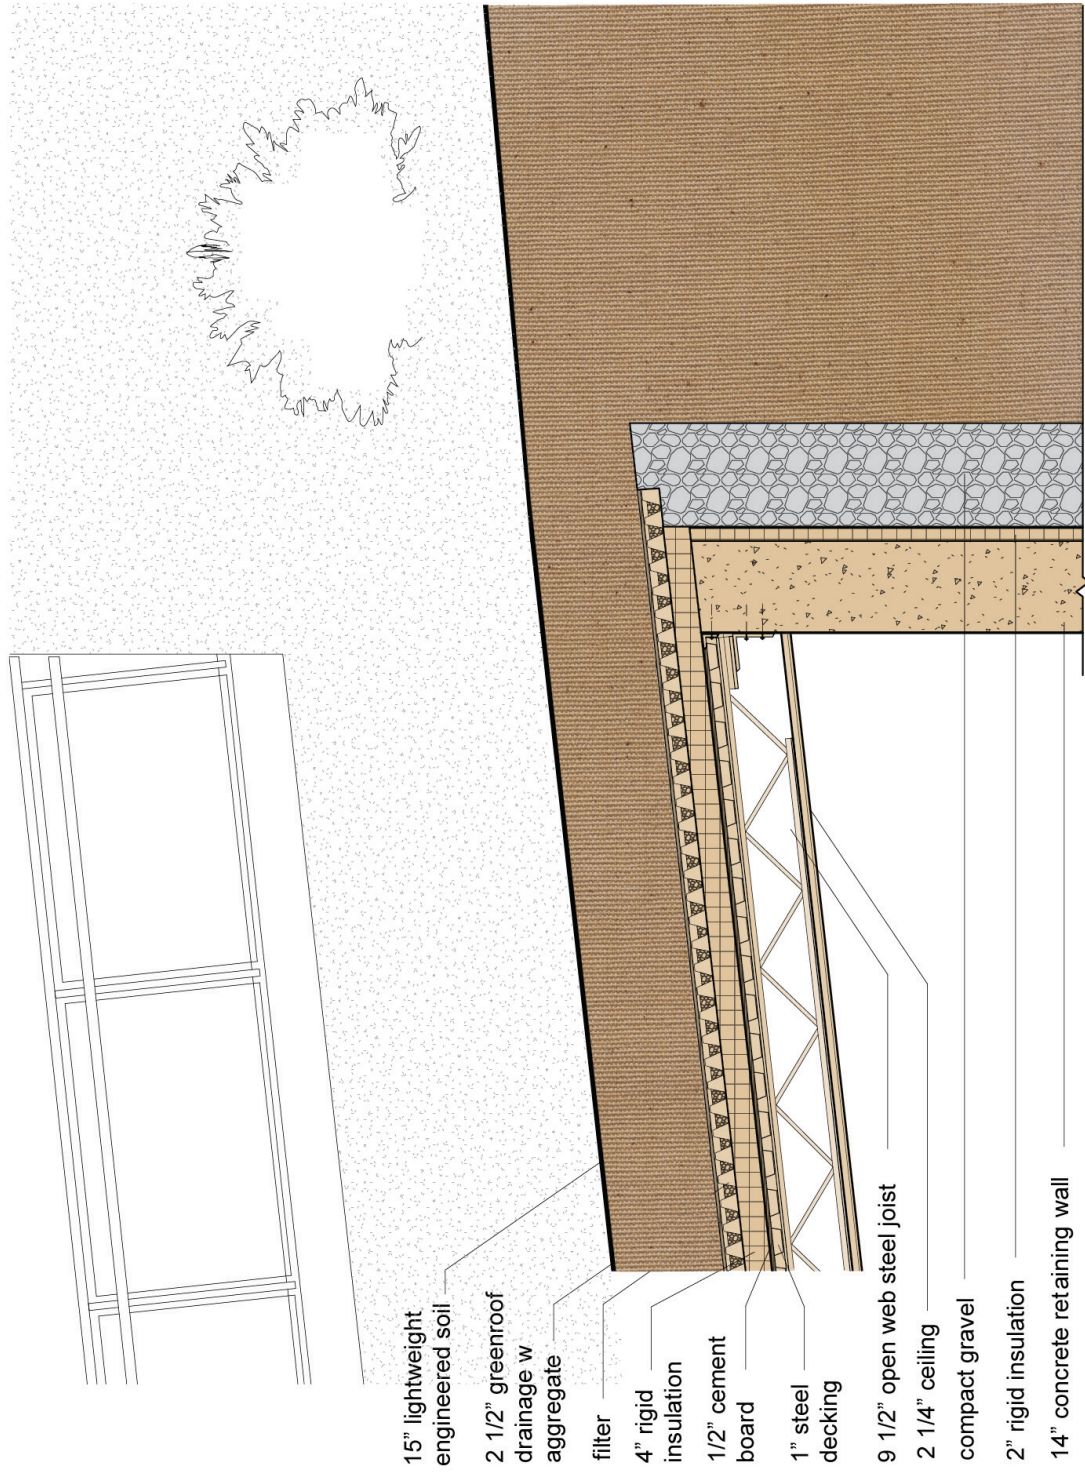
Section axonometric detail of the hill as it transitions into the greenroof of the store.
